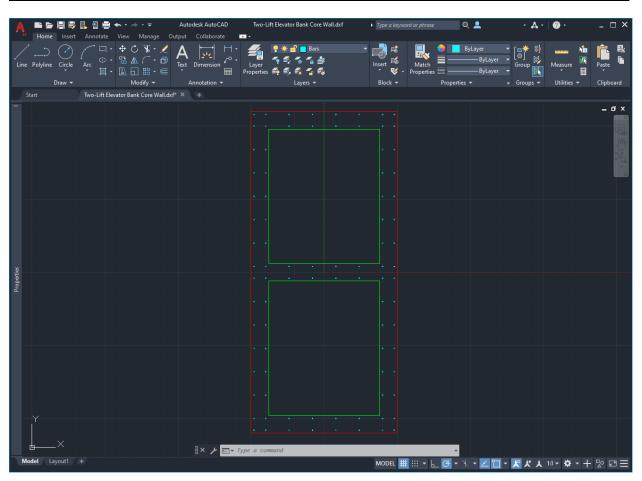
Core wall Section Using AutoCad (.dxf file)
